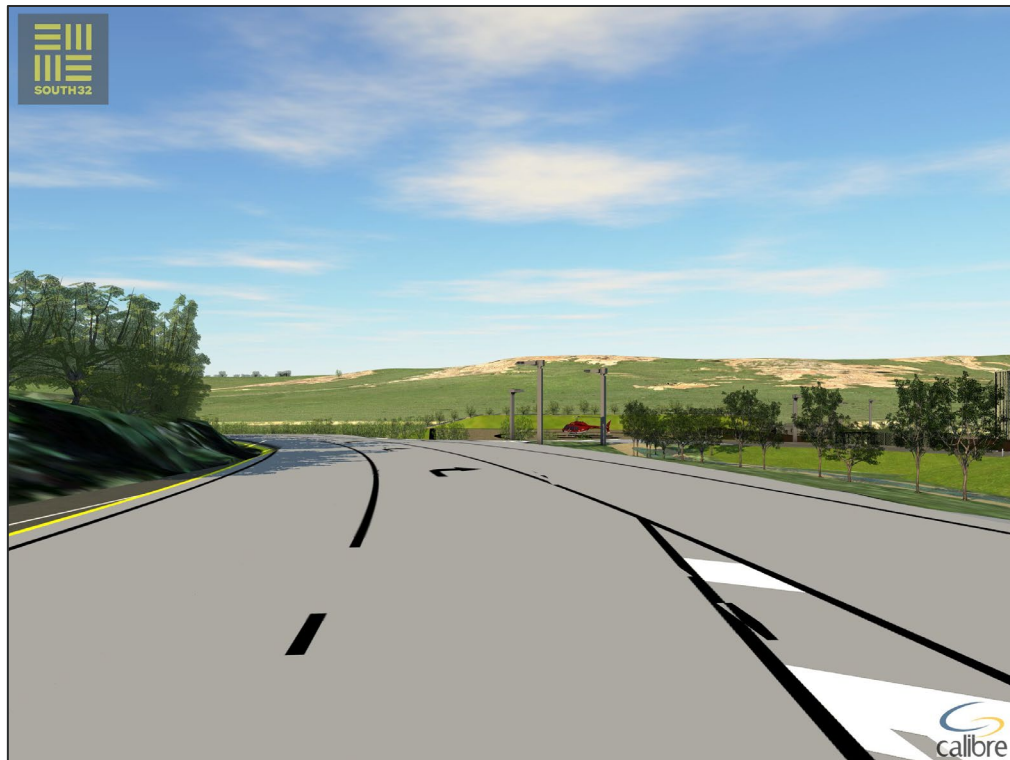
View towards the Site from Menangle Road, heading north toward Site entrance (Site screen plantings at maturity)
